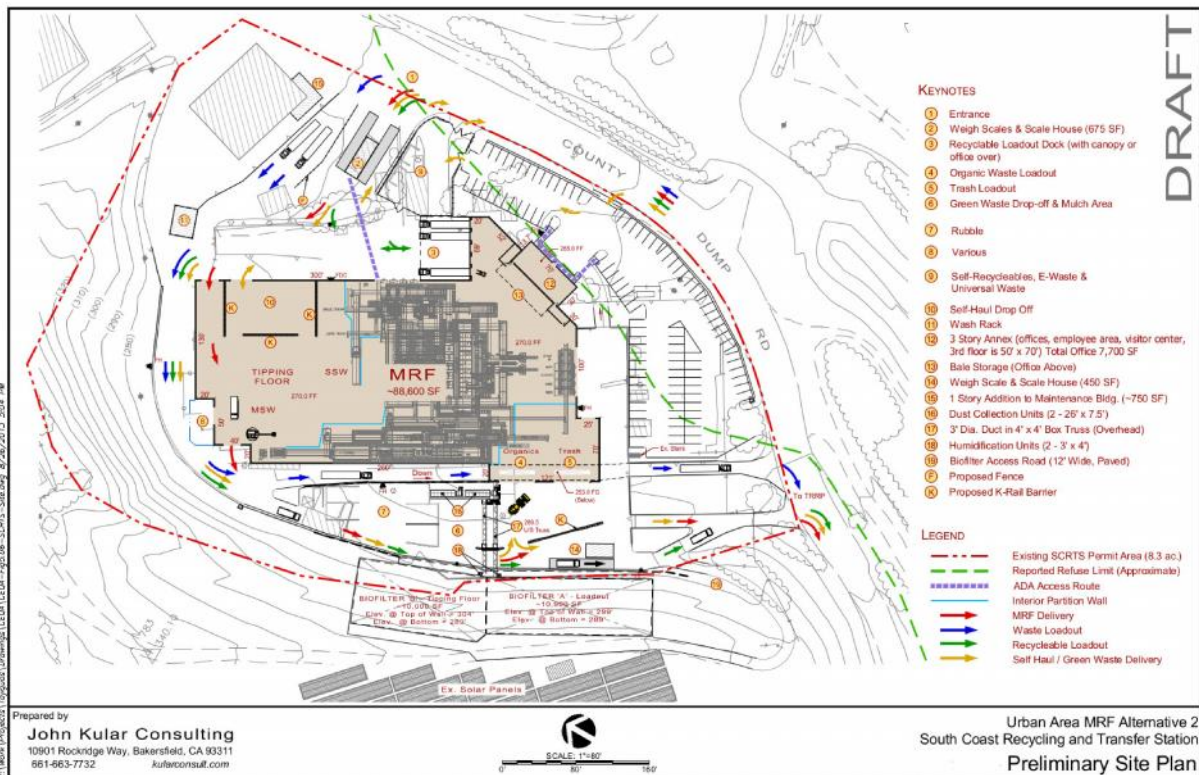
Alternative C – South Coast Recycling and Transfer Station Site Plan
